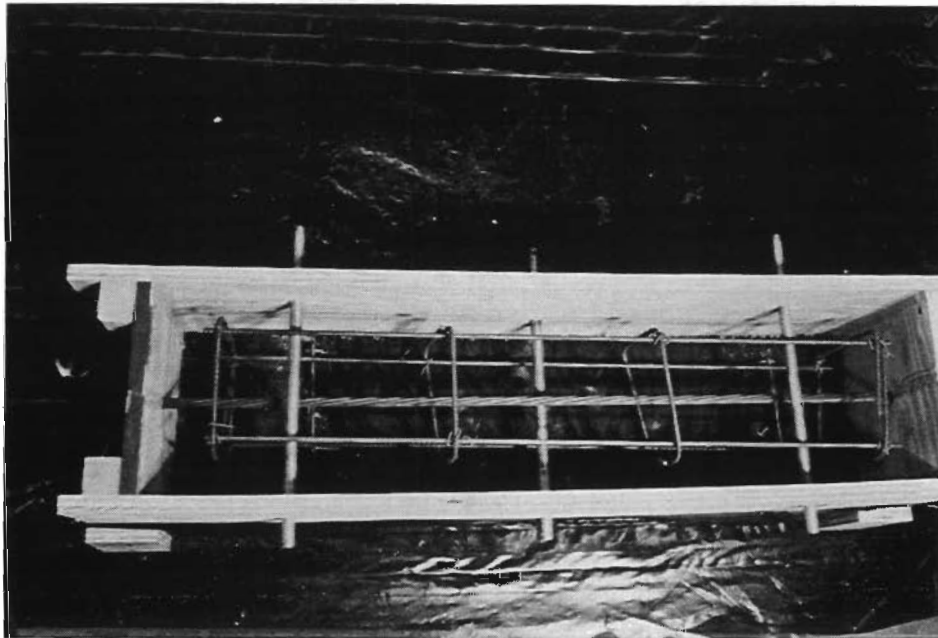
3 Concrete blocks for providing end restraints - before casting
